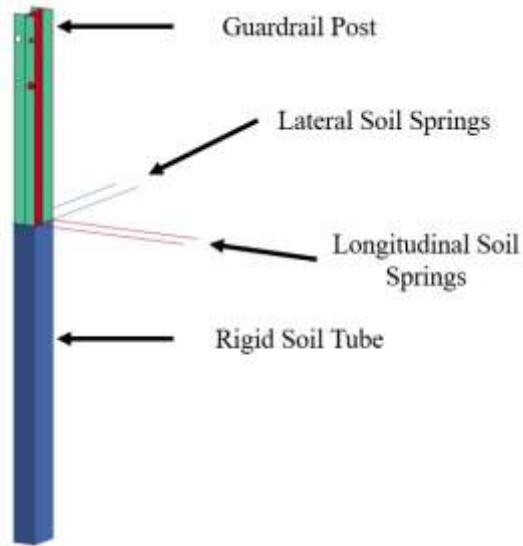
Guardrail Post with Soil Tube and Soil Springs
